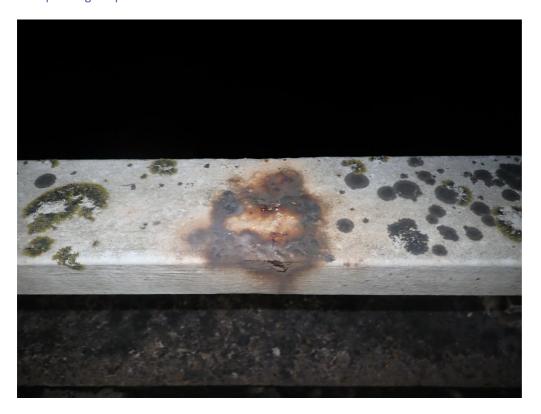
Area of paint loss to the North Parapet where corrosion has occurred
